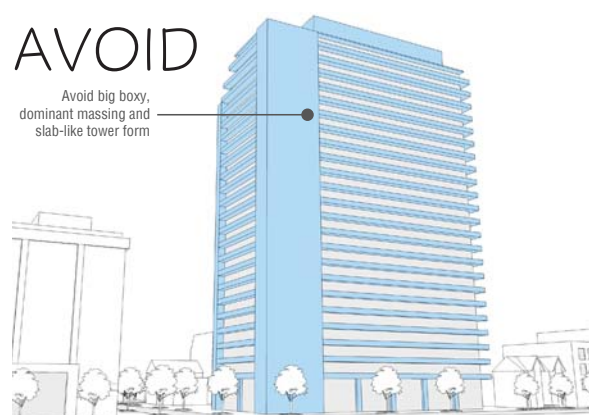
Large, elongated floor plates cast long shadows and create an inappropriate scale at street level.
